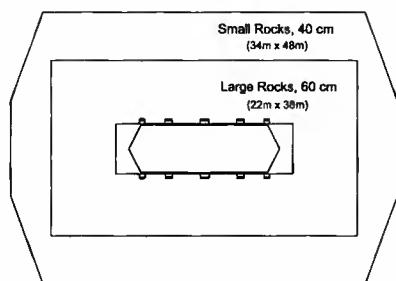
Plan layout of the largest scour protection (Pier Type A).
